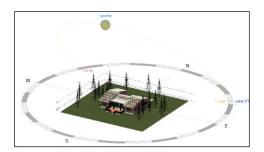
Revit model shown with shadows on June 21. Note that the overhangs prevent the solar gain from penetrating through the direct gain windows as well as the sunspace and Trombe wall.
